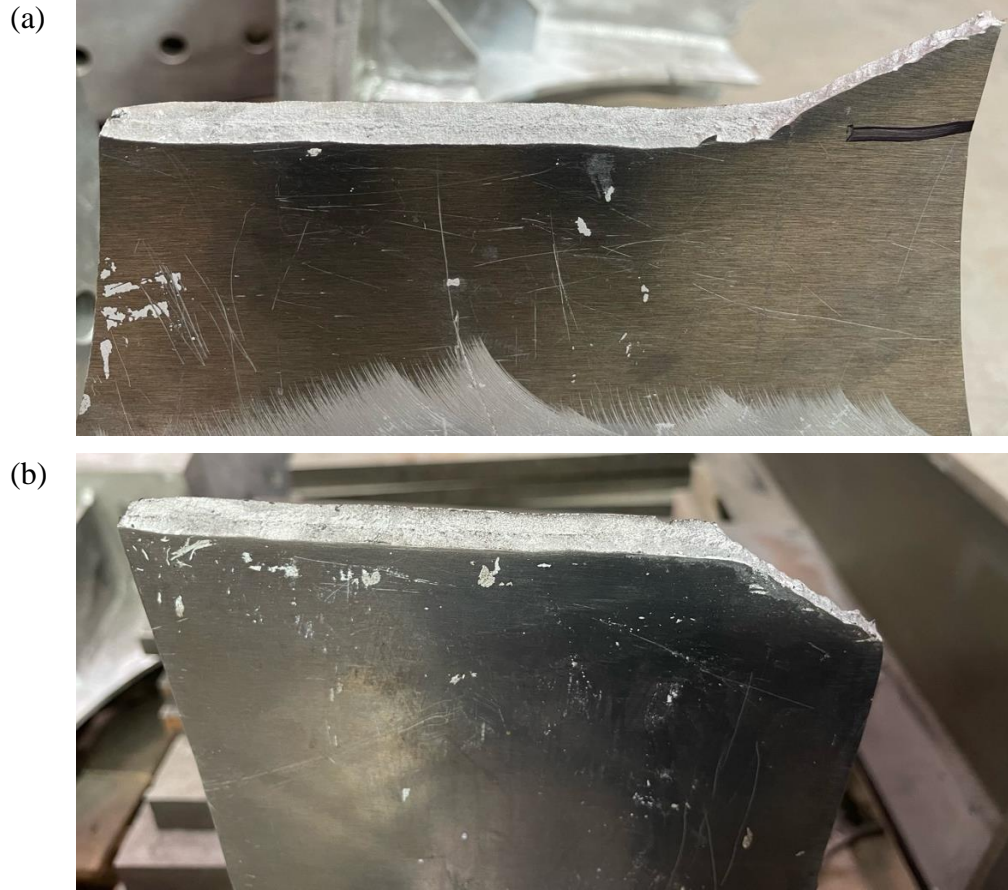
Fracture surfaces of Specimen F3: (a) upper fracture surface and (b) lower fracture surface (other specimens showed similar behavior)
